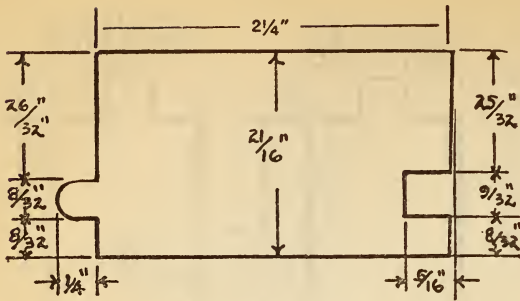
1½ by 3 inch kiln-dried flooring, green, 2⅜-inch face
